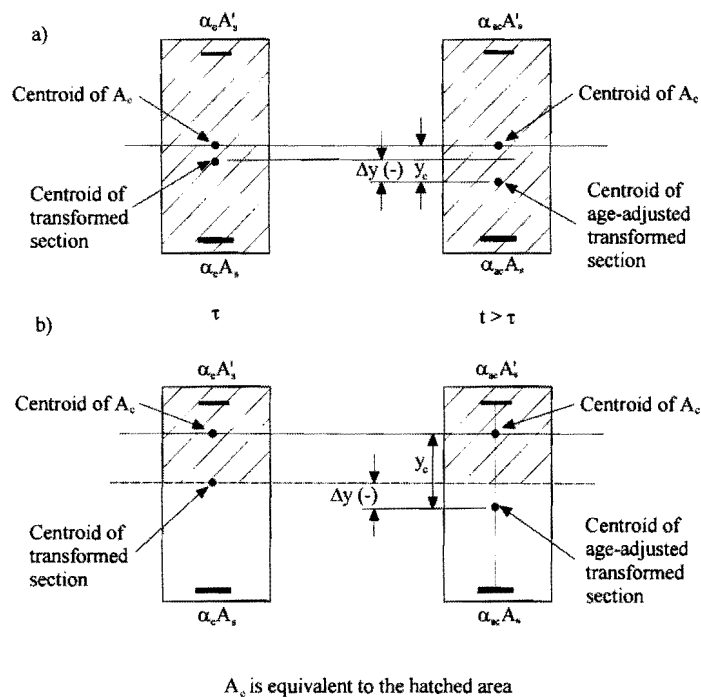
Creep section parameters for a) uncracked section; b) cracked section
